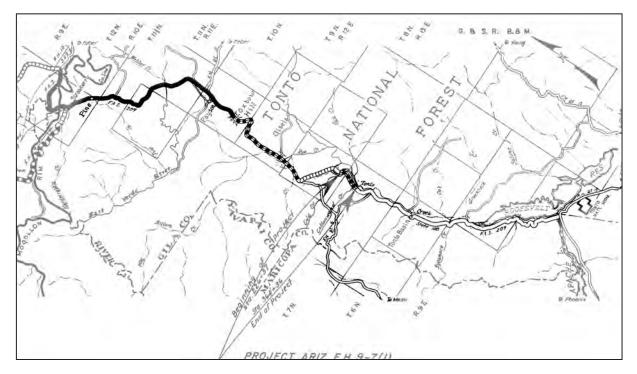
As Constructed Plan for Project FH 9-7 (1), 1964, from Theodore Roosevelt Lake to Pine (U.S. Department of Commerce, Bureau of Public Roads 1964).
